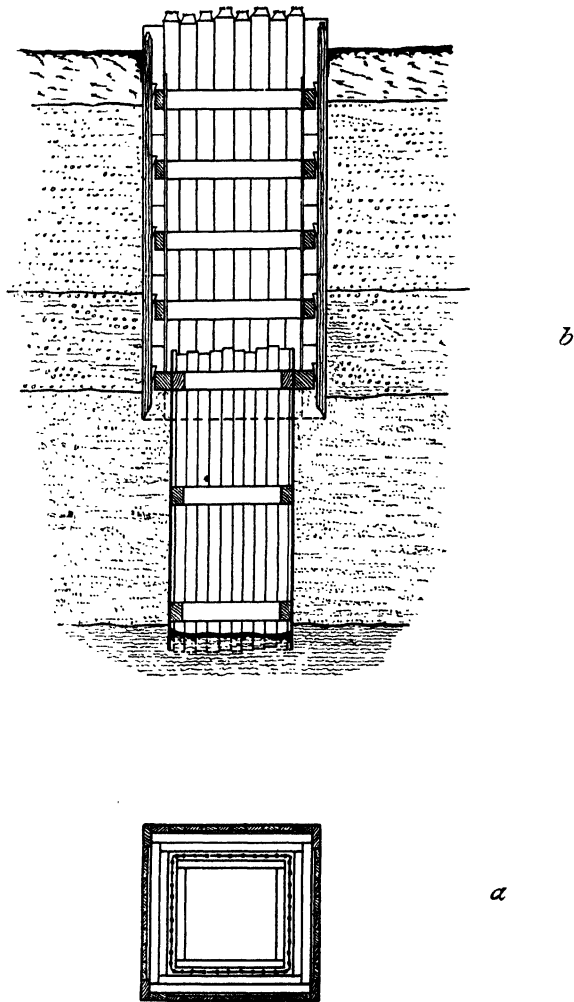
Test Pit, with Runners and One Setting of Steel Piles.
